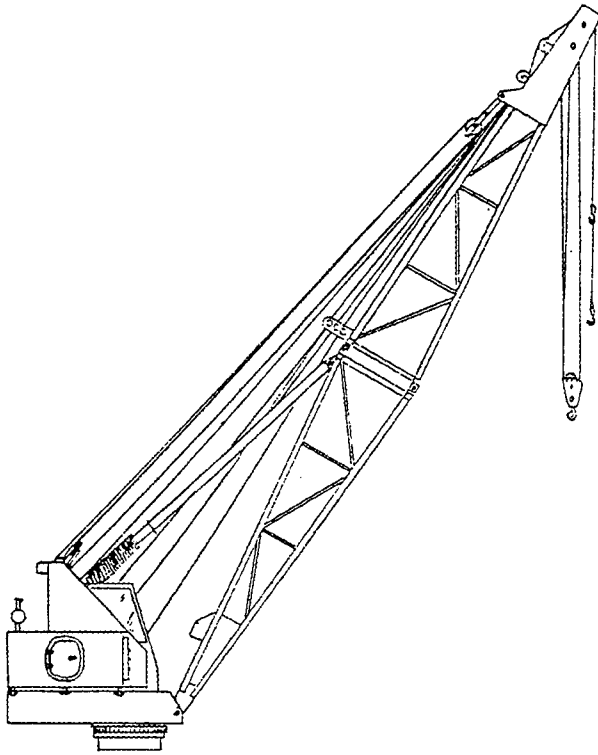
CG-300 Crane & D6 Diesel Hammer
